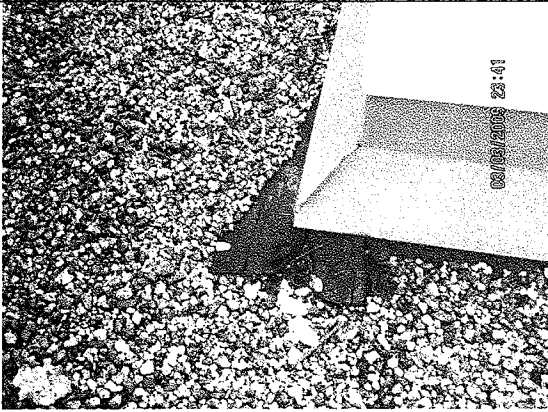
Corner of access hatch where membrane is starting to crack and pull away from curb.
